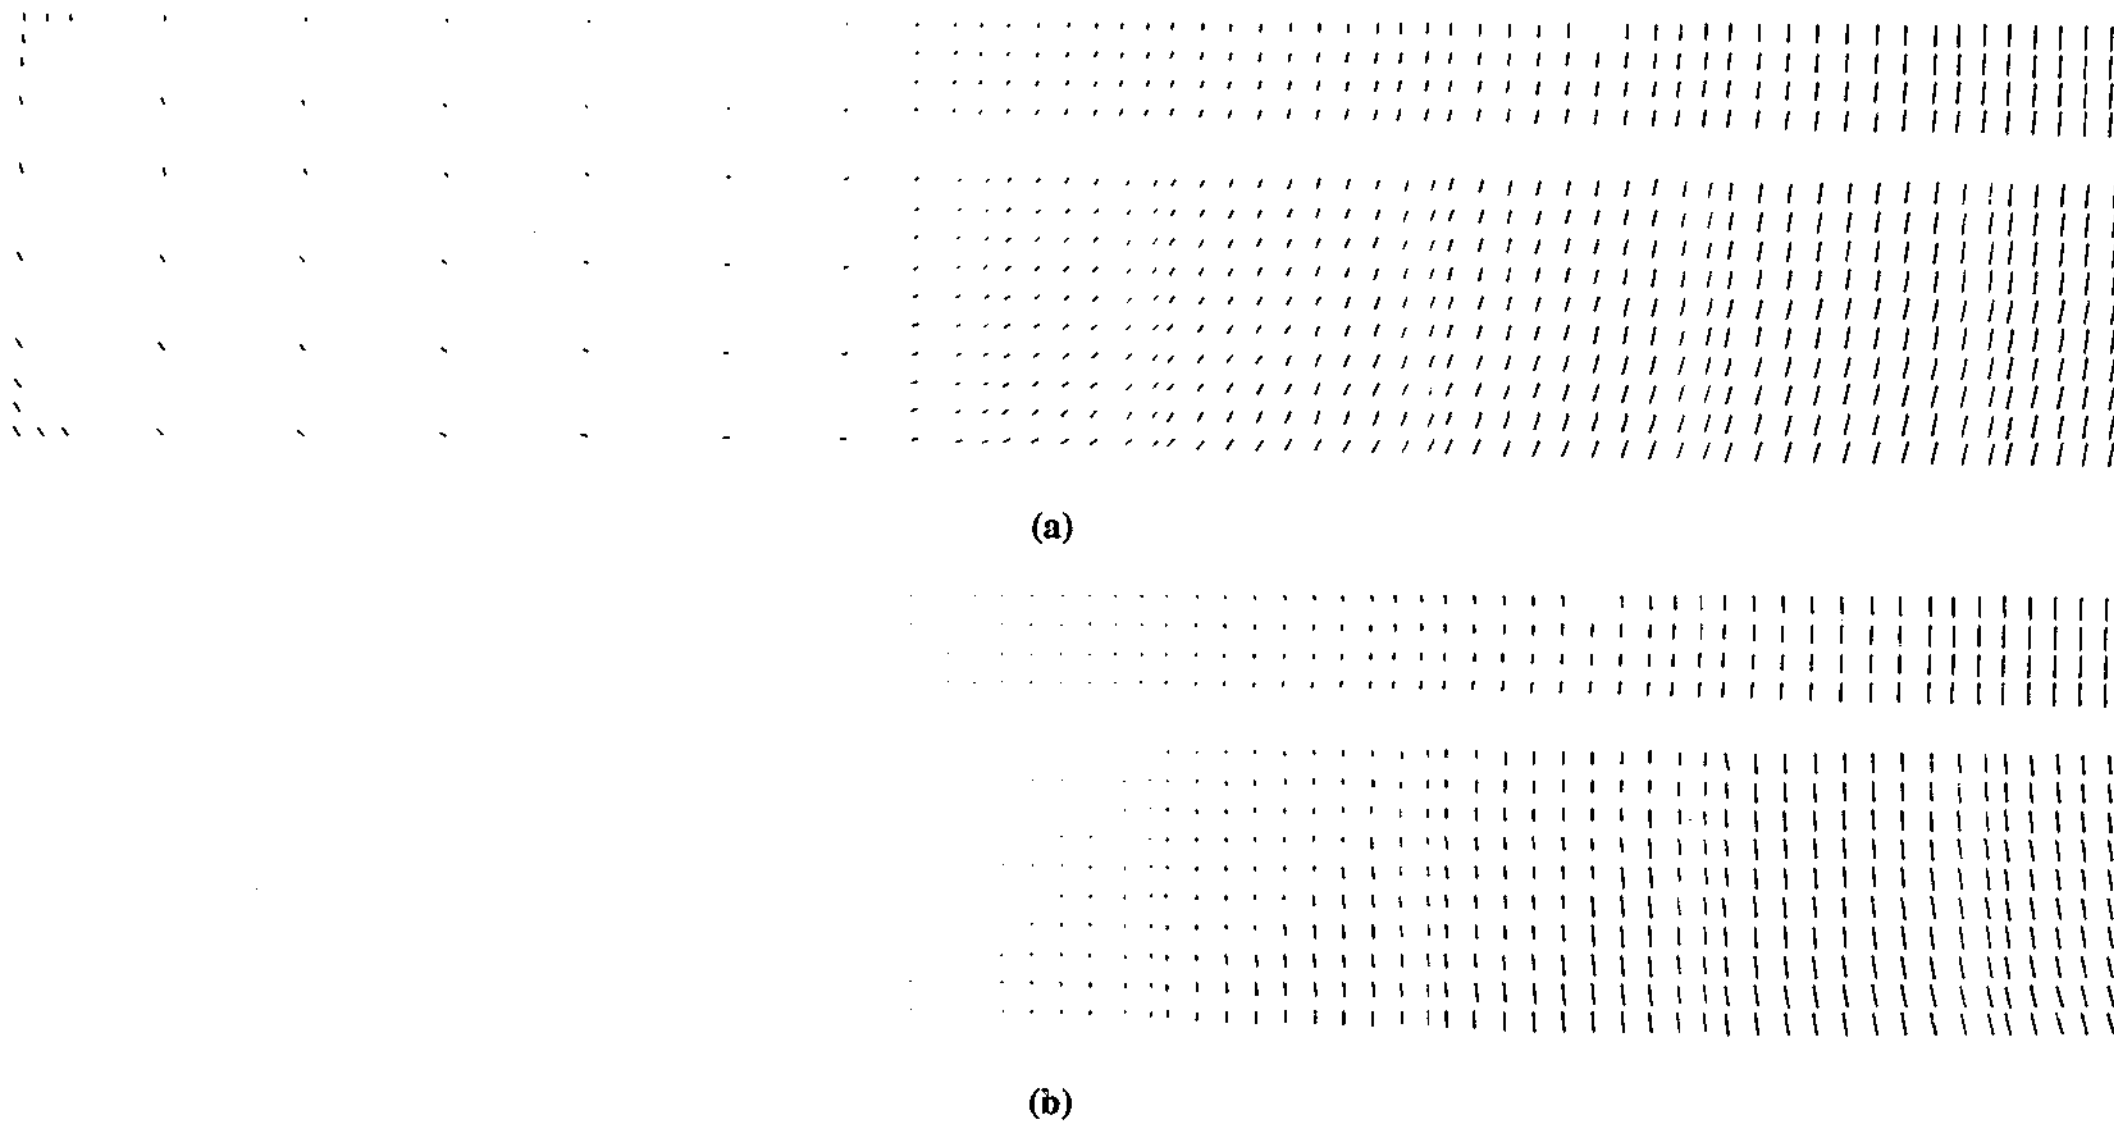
Beam '0.60D' deformation with respect to (a) external stationary point and (b) concrete overhang
